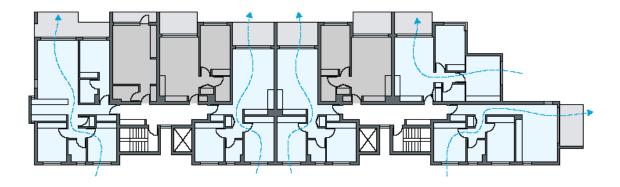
Examples of Apartments Achieving Effective Natural Cross Ventilation (from Apartment Design Guide, floor plan of a typical residential building)
